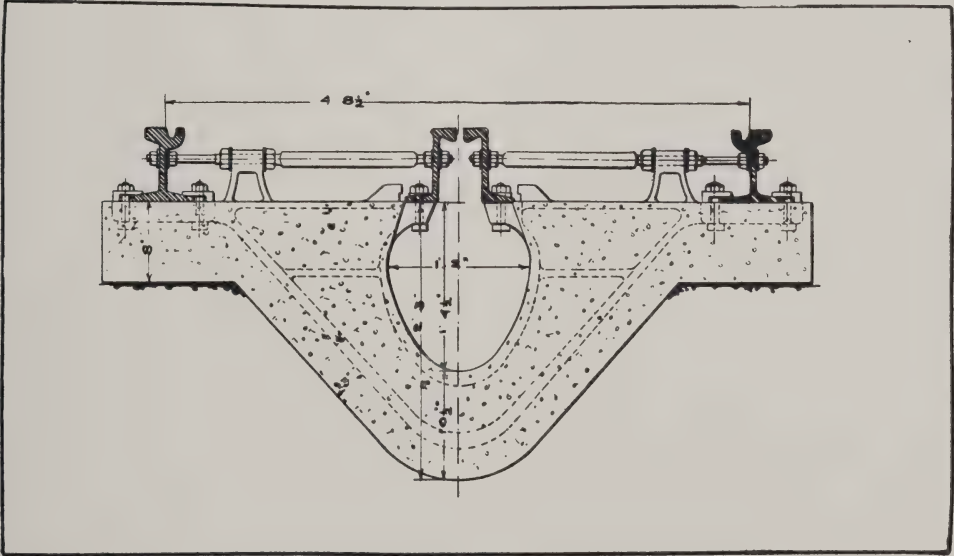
,—WESTINGHOUSE ELECTRIC CONDUIT: SECTION AT YOKE.
